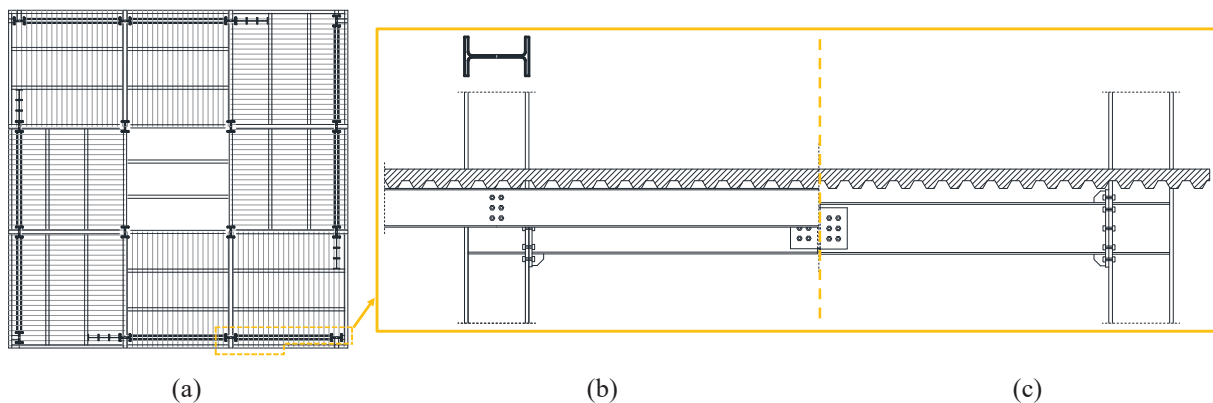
Proposed solution for the replaceable dissipative components: (a) floor layout – with arrangement of columns / main beams / secondary beams / steel deck for the concrete slab; (b) secondary beams from the façade; (c) replaceable dissipative components (main beams decoupled from secondary beams and concrete slab).
